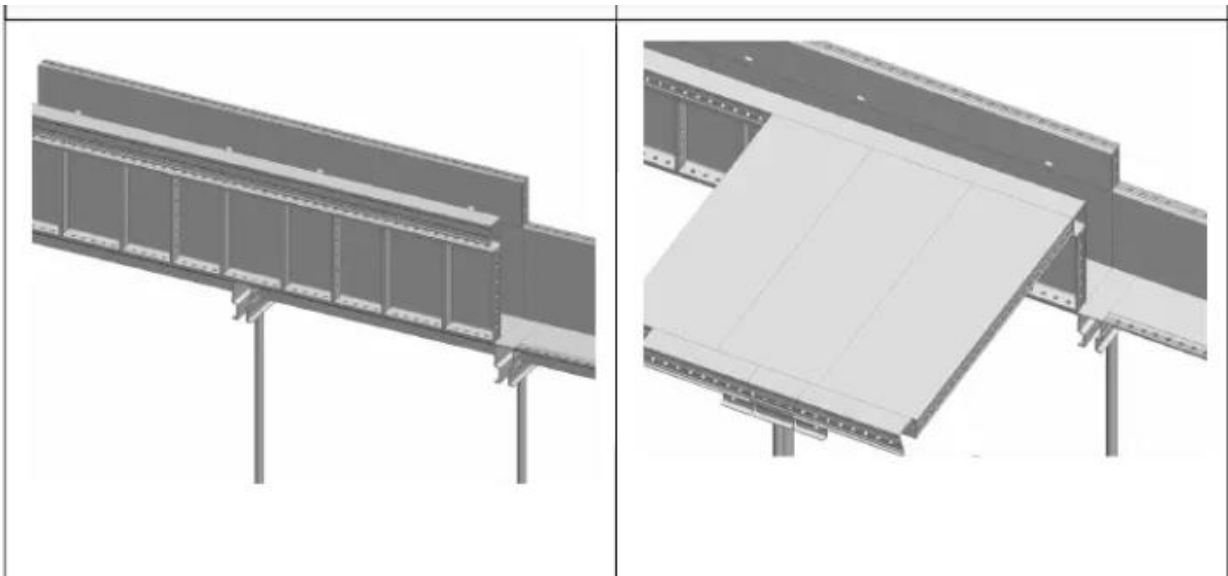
B Abeam and slab assembly Aluminum form work production center)
